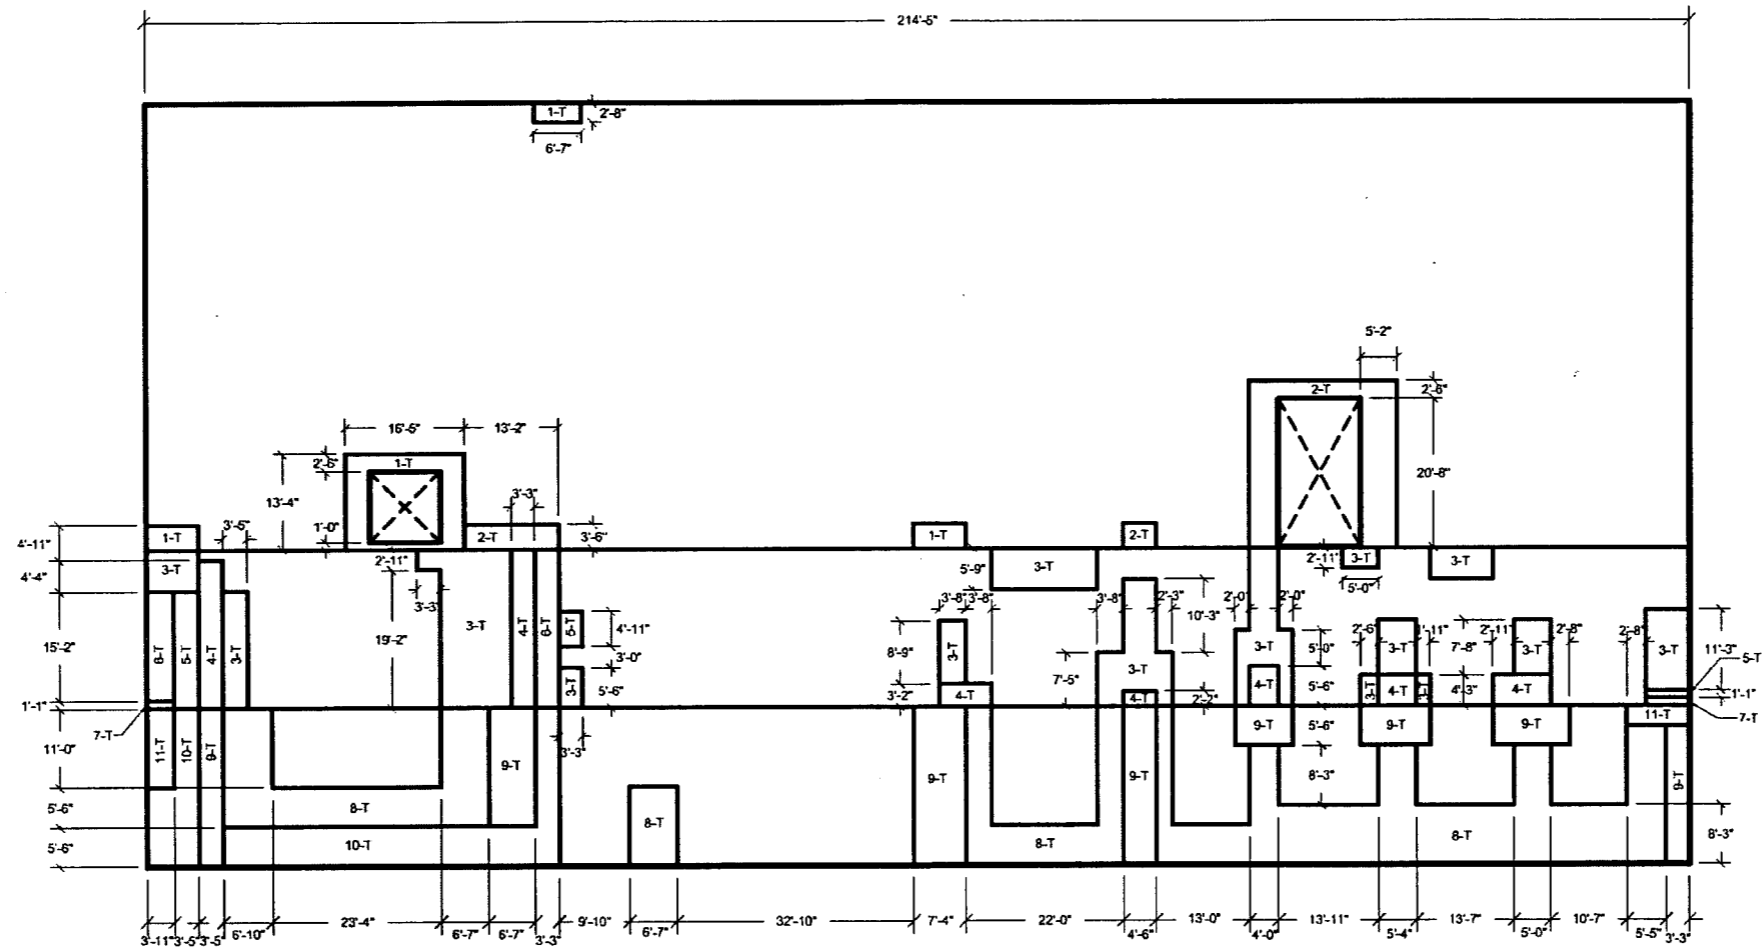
H.3-9: NORTH WALL LOOKING SOUTH
